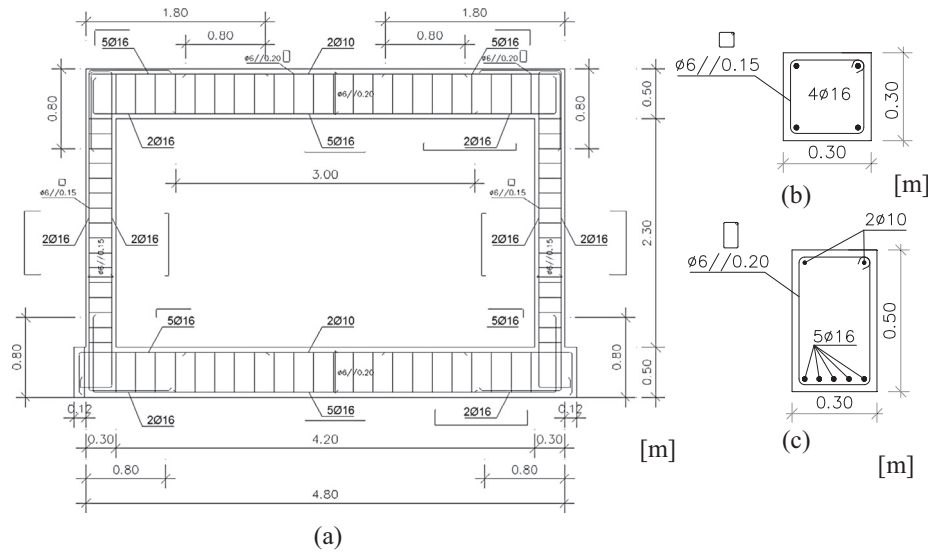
Infilled RC frame specimen dimensions (in m): (a) general dimensions, (b) column and (c) beam dimensions and reinforcement detailing.
